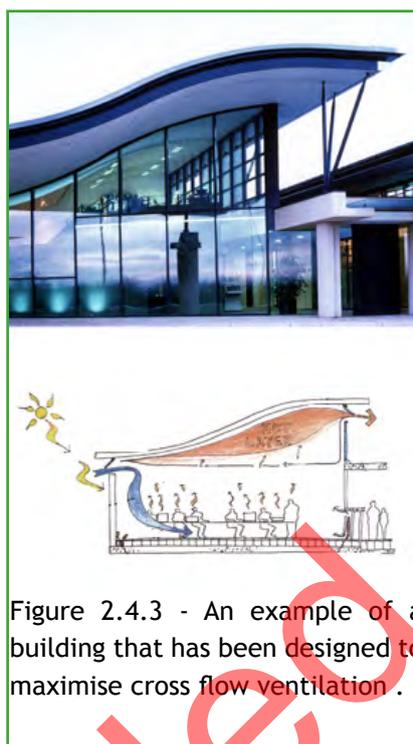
An example of a building that has been designed to maximise cross flow ventilation .
